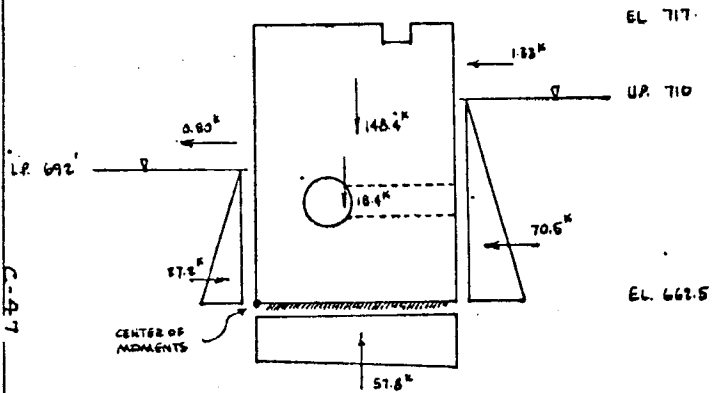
MIDDLE WALL - LOWER CHAMBER AT CULVERTS MONOLITH M-22
